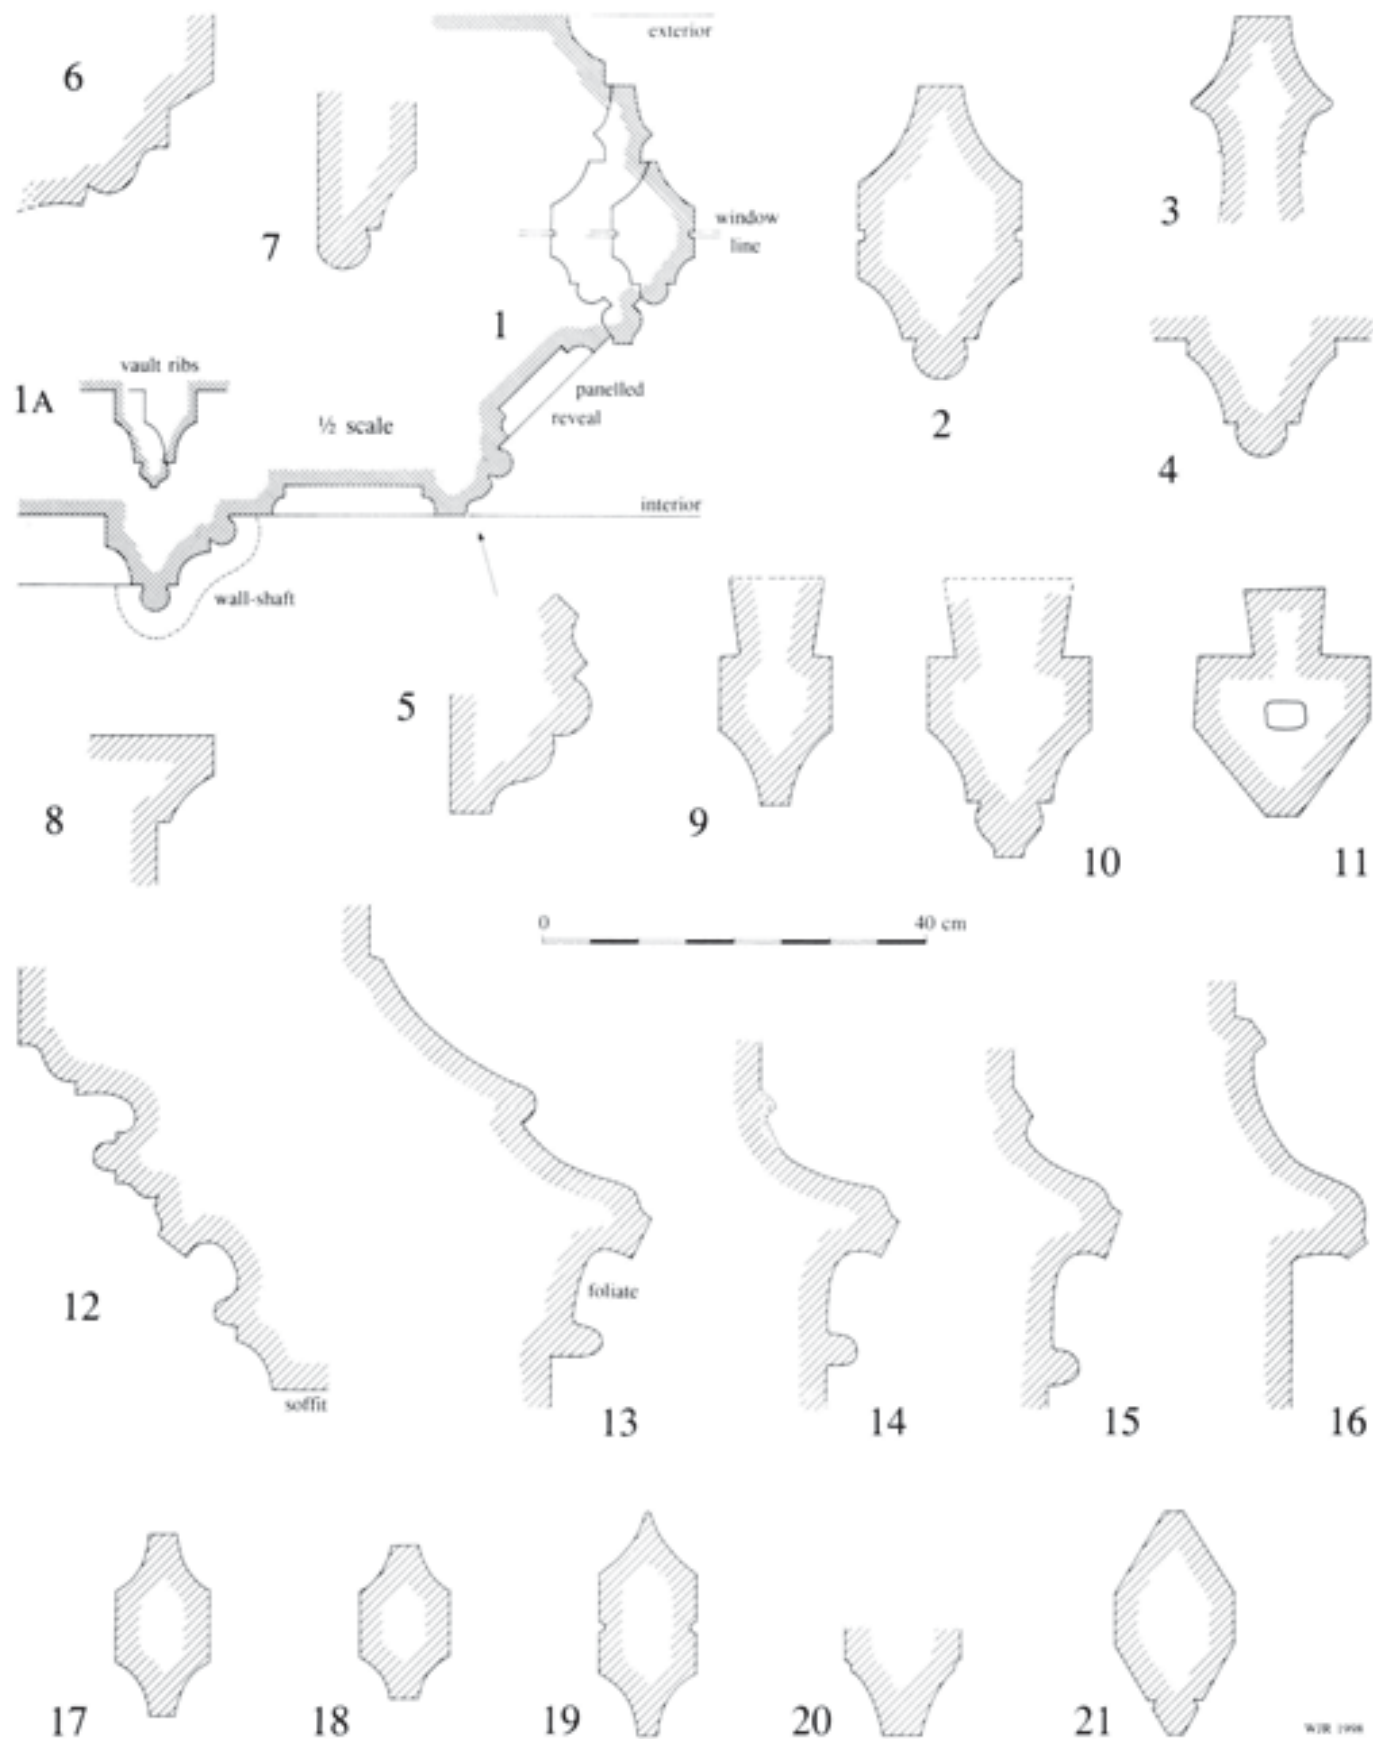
Profiles of Doulting stone mouldings associated with Stillington's chapel. 1, Reconstructed suite of mouldings for window jambs, panelled reveals and wall-shafts (after Buckle 1894); 1A, Reconstructed profiles of vault ribs (after Buckle 1894); 2, Window mullion (F336 and F1257); 3, Fragment of king-mullion (F1204); 4, Panel mullion (west wall); 5, Panelled-reveal moulding (F1218); 6, Respond or wall-shaft (unstrat.); 7, Respond? (F423); 8, Wall-bench (west end); 9, Vault rib (F430); 10, Vault rib (F38); 11, Unmoulded vault rib (boss no. 19); 12, External door-arch (in east cloister walk); 13, Enriched string-course above west doorway (west wall); 14, High-level internal string-course (west wall); 15, High-level buttress string-course (exterior, south nave wall); 16, Main external plinth (south nave); 17, Screen mullion (unstrat.); 18, Screen mullion (F420); 19, Window mullion, possibly from sacristy (F1206); 20, Mullion or vault rib (F391); 21, Large screen mullion, probably from cloister (unstrat.). Scale 1:8 (except 1 and 1A, 1:16)
